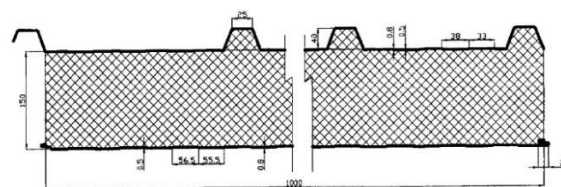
The geometrical dimensions of the roof panel of the “AluTerm” series (cross-section) submitted for testing.
